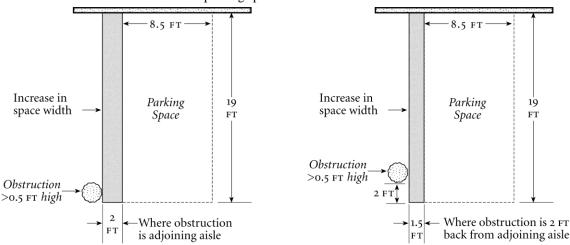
PARKING SPACES ADJOINING AN OBSTRUCTION
